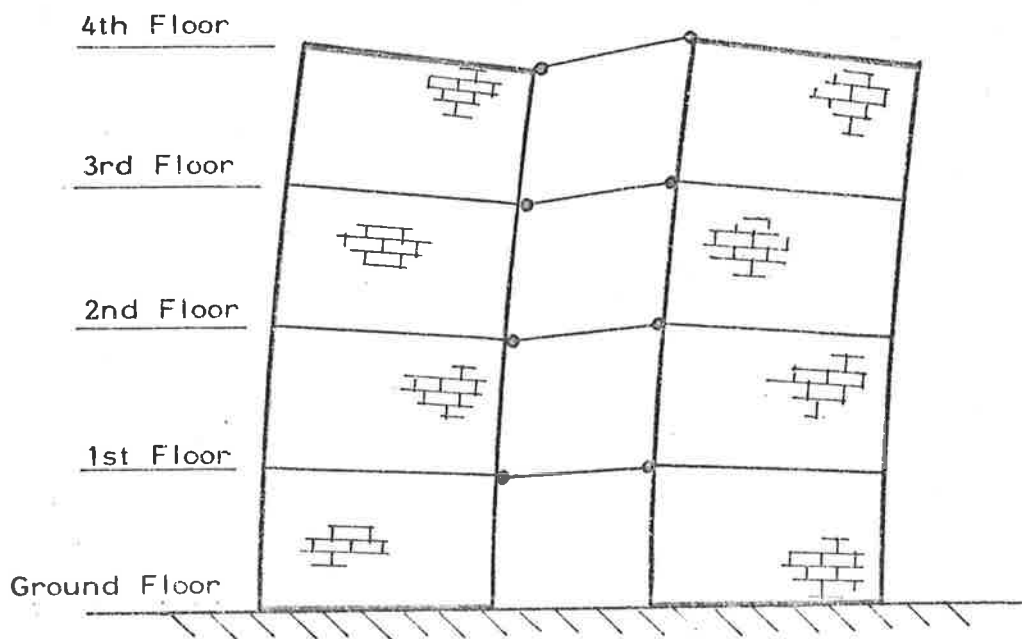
Assumed Cantilever Action of High-rise Brickwork Structure
